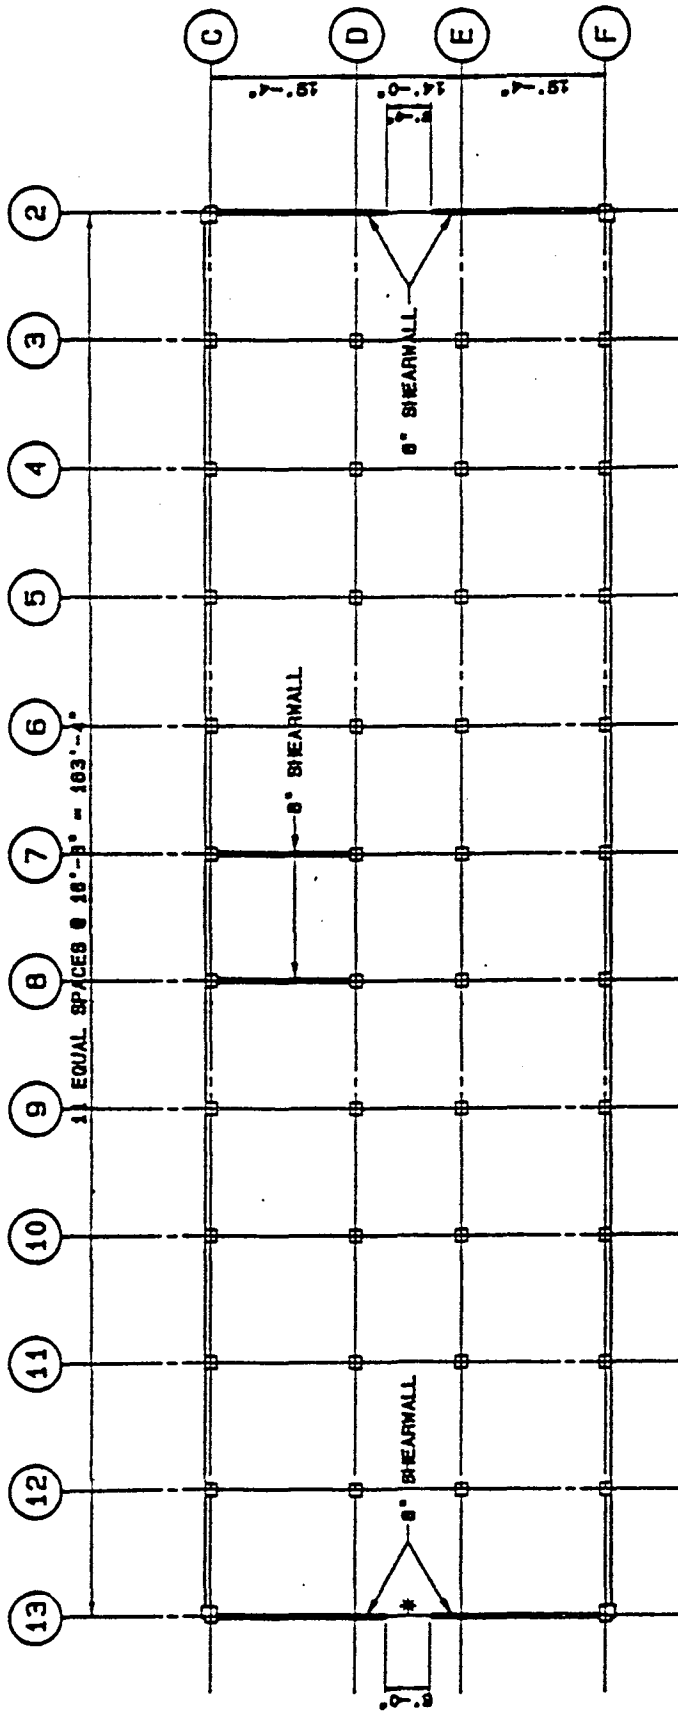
PLAN LAYOUT OF A CONCRETE MASONRY BUILDING
